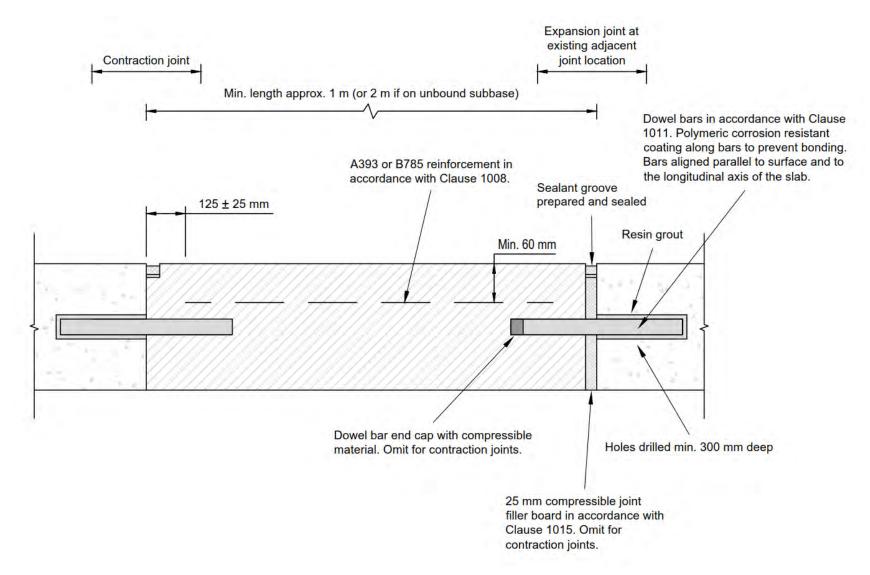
Longitudinal section of a full depth repair to URC adjacent to an existing transverse joint
